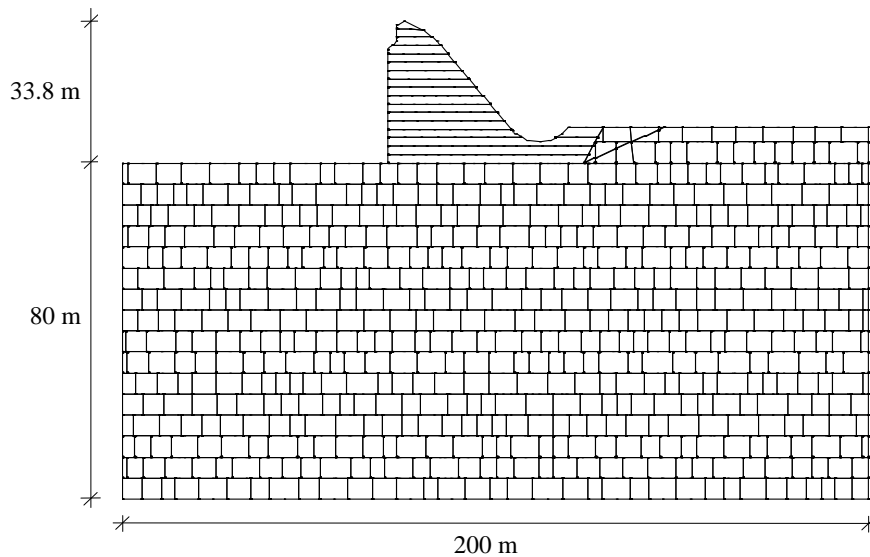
UDEC model of Pedrógão dam foundation.
